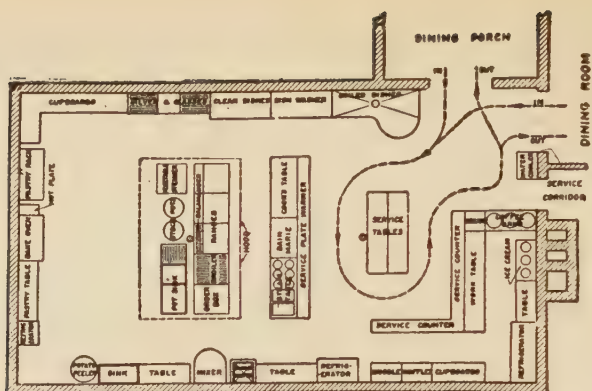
This floor plan shows the route followed by waitresses. Note the six foot passageway between the kitchen and dining room. This lessens noise in the dining room.
